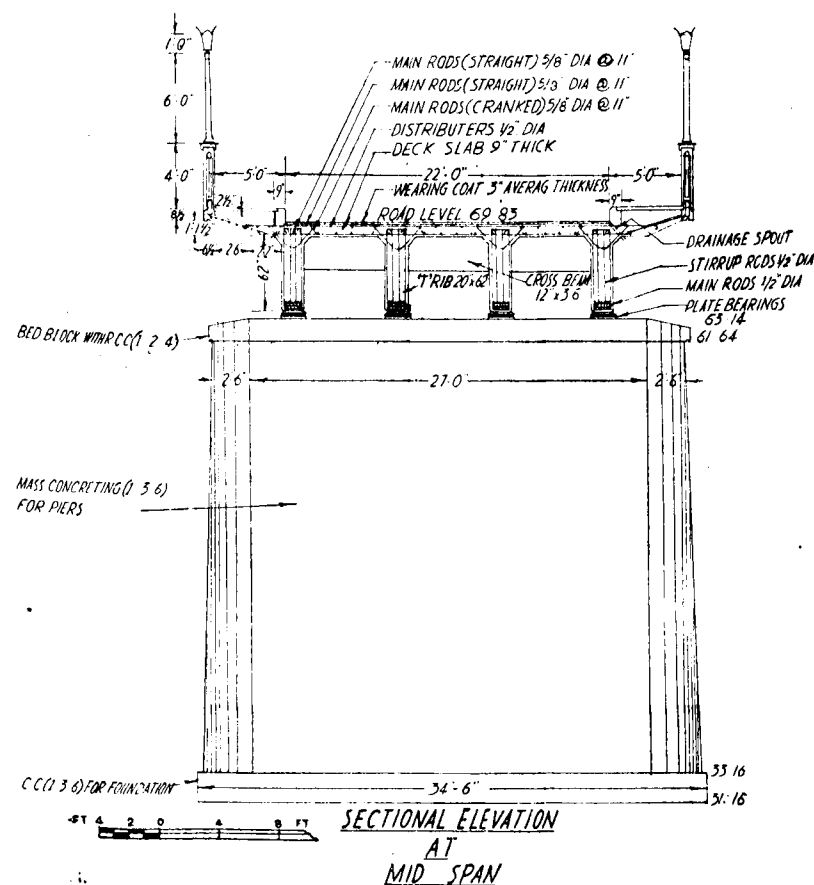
Sectional elevation showing details of well foundations and superstructure of 61 ft-0 in. (clear) spans
